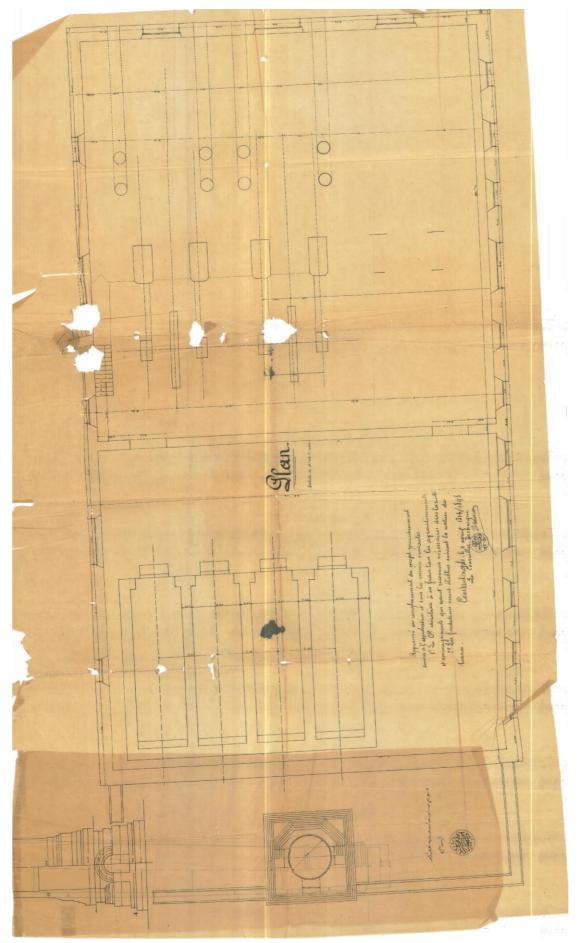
3. Halkapınar Water Pump Building Plan in 1898 (İZSU Archive).
